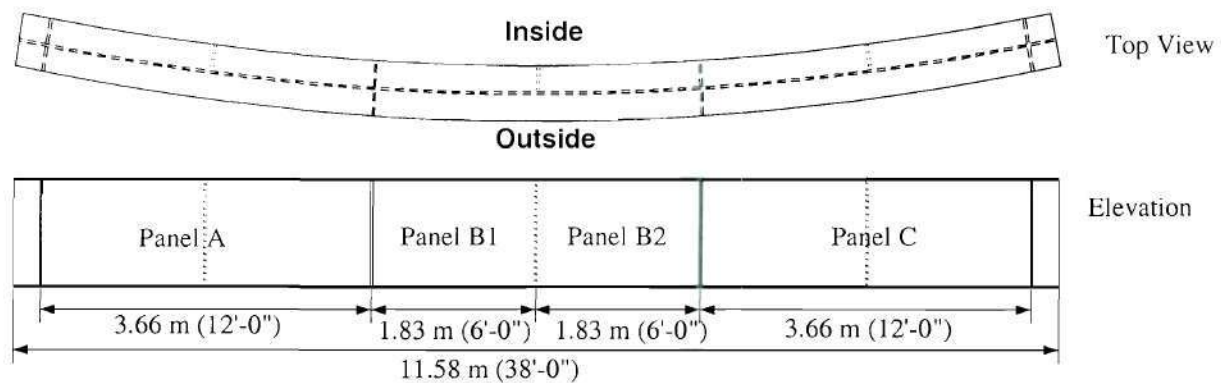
Geometry and longitudinal dimensions of test girders S1-S and S2-S
